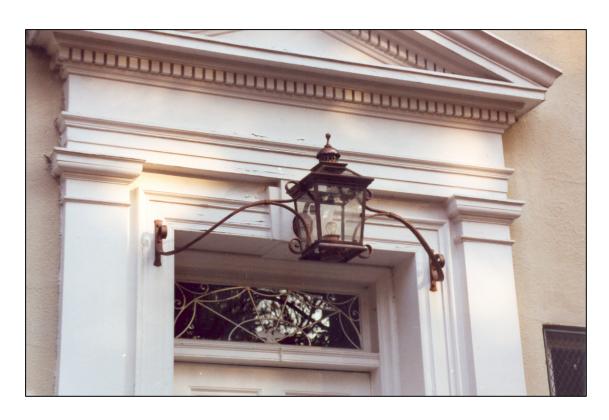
Morristown Museum Building: south façade of main/front structure, 1937 light fixture at D101 (2001).
